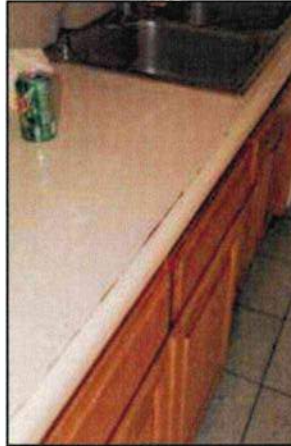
Fire Station #1 Kitchen countertops are deteriorated.
